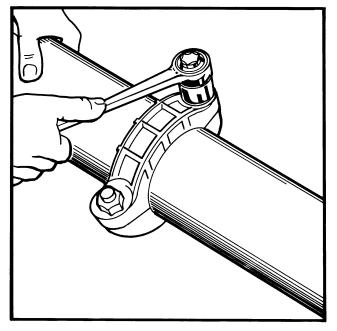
Installed Coupling Fastening Grooved Pipe Ends
